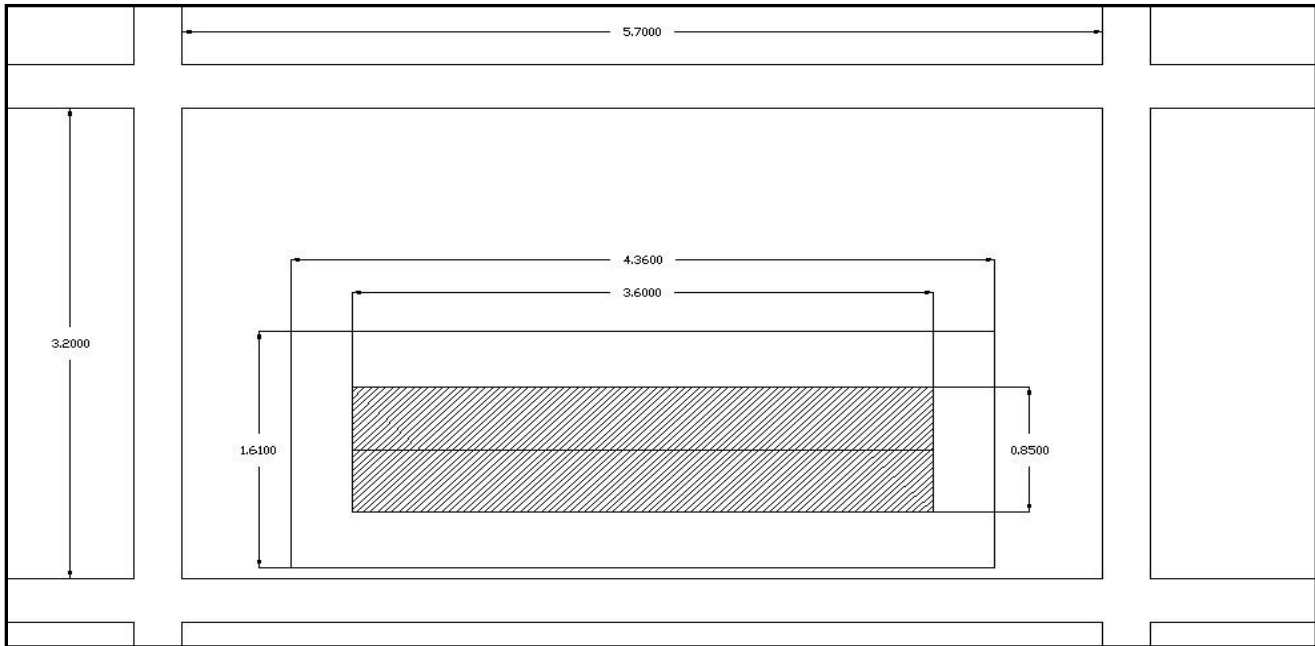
IRC CLASS AA LOADING ON PSC I GIRDER BRIDGE
